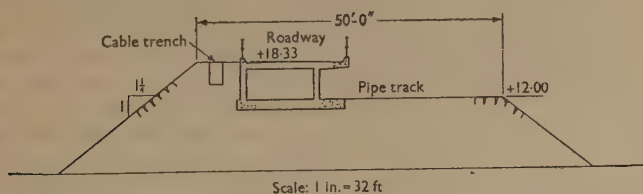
CROSS-SECTION THROUGH BUND AND SHORE ABUTMENT
